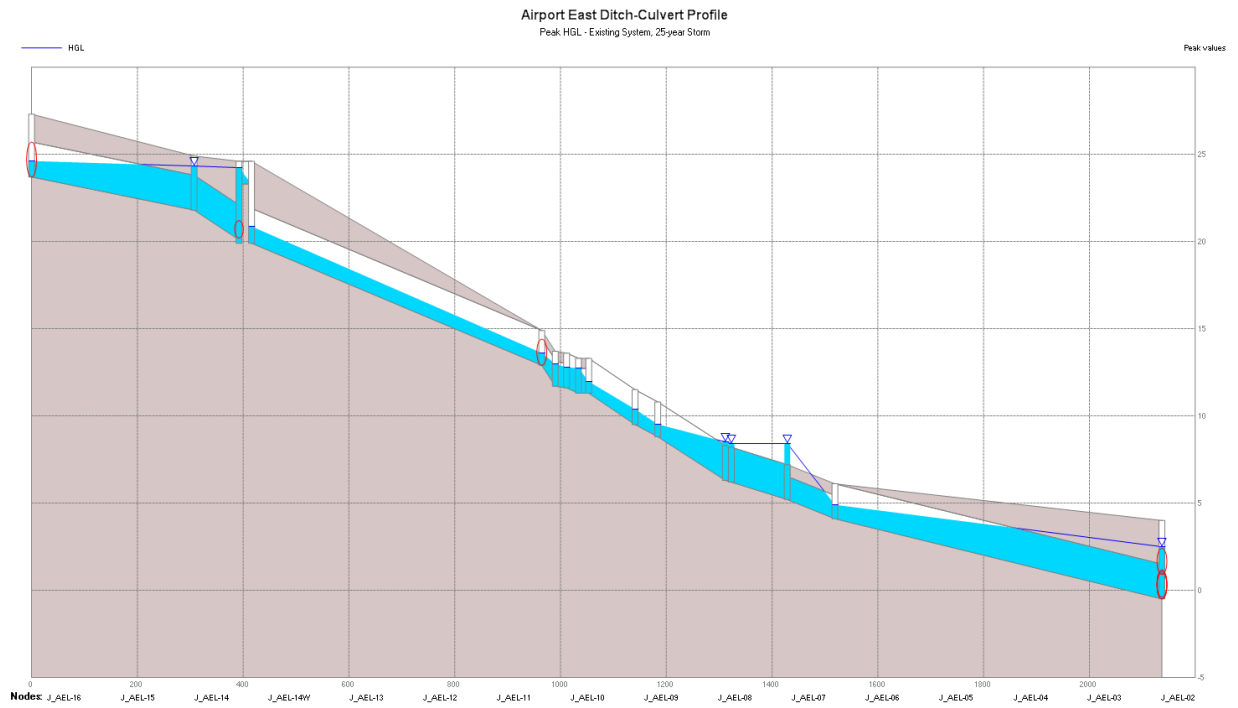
Airport East Ditch & Culvert System Profile – Existing Conditions
